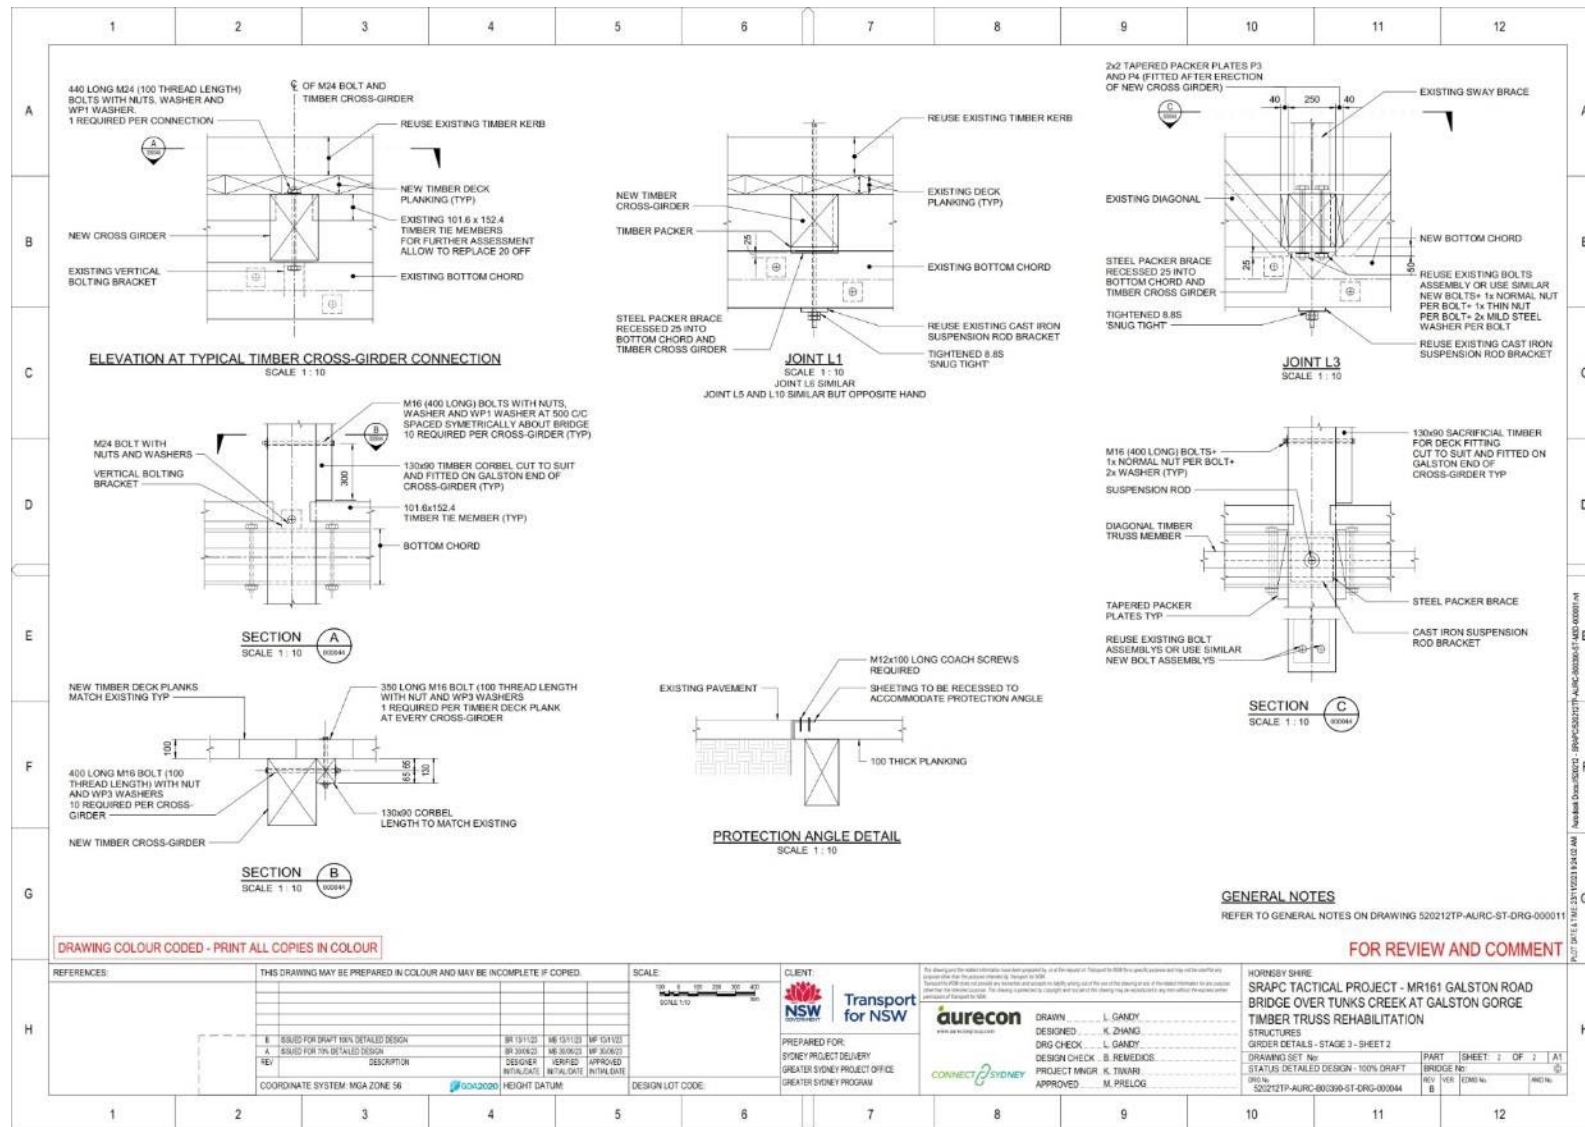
Structures girder details – Stage 3, sheet 2: 520212TP-AURC-B00390-ST-DRG-000044 (Source: Aurecon)
